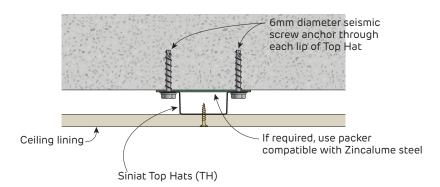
Internal or External Top Hat Ceiling under Concrete
